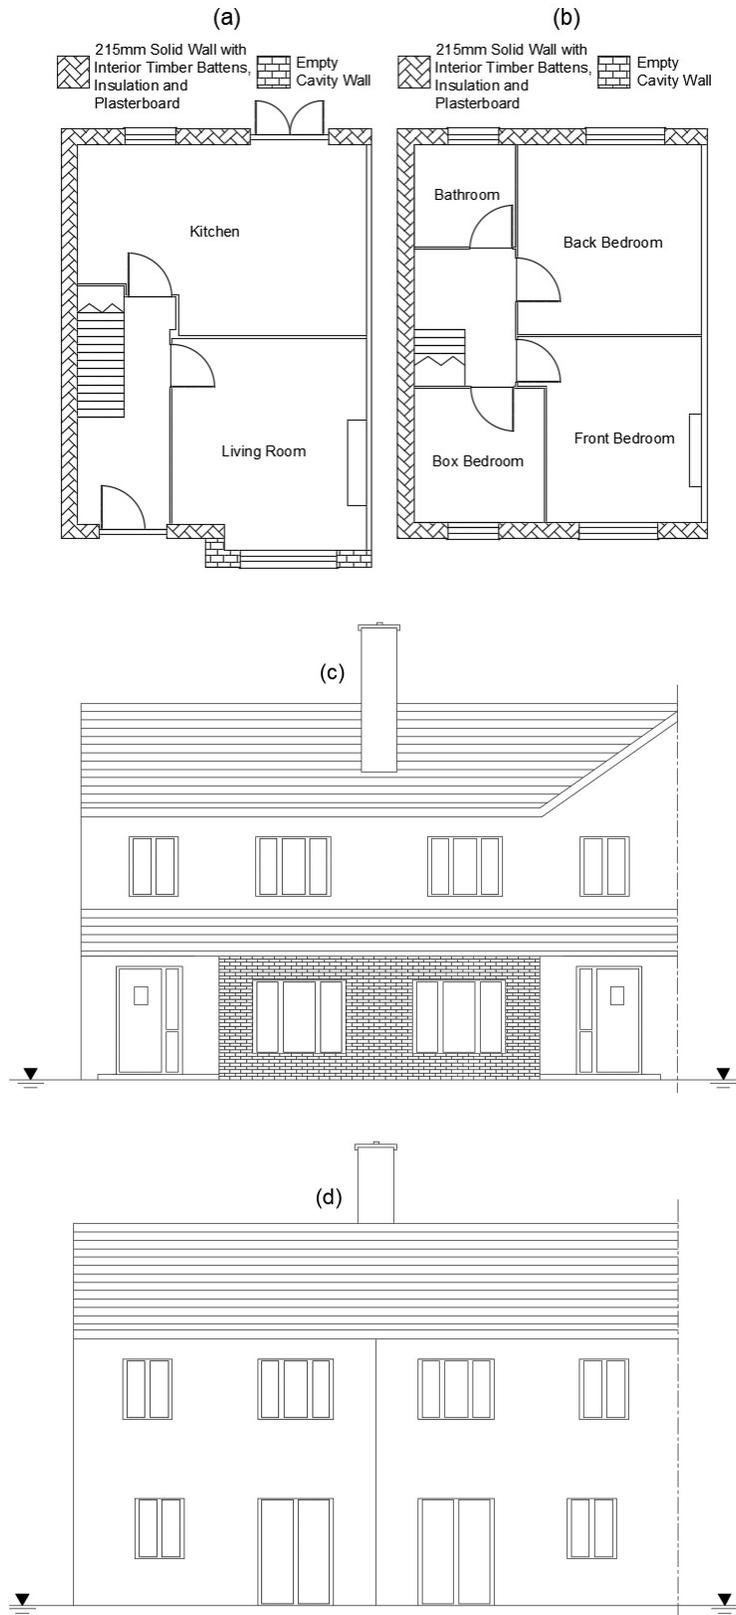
(a) Ground floor layout, (b) First floor layout, (c) Front façade and (d) Back façade of the 1994 mid- and end-terrace case study building.
